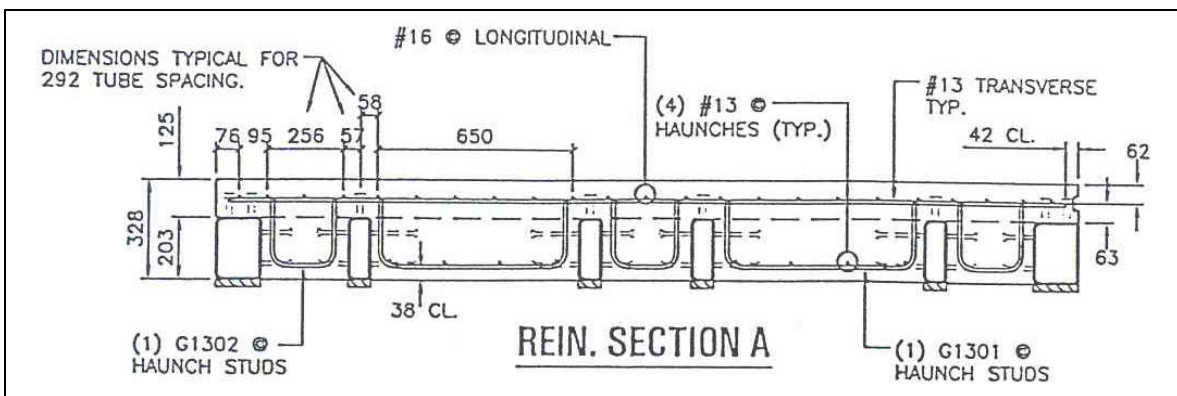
Typical panel cross section at full-depth portions showing reinforcement for bridge over Cascadilla Creek, Ithaca, NY (The Fort Miller Co., Inc., 2001)
